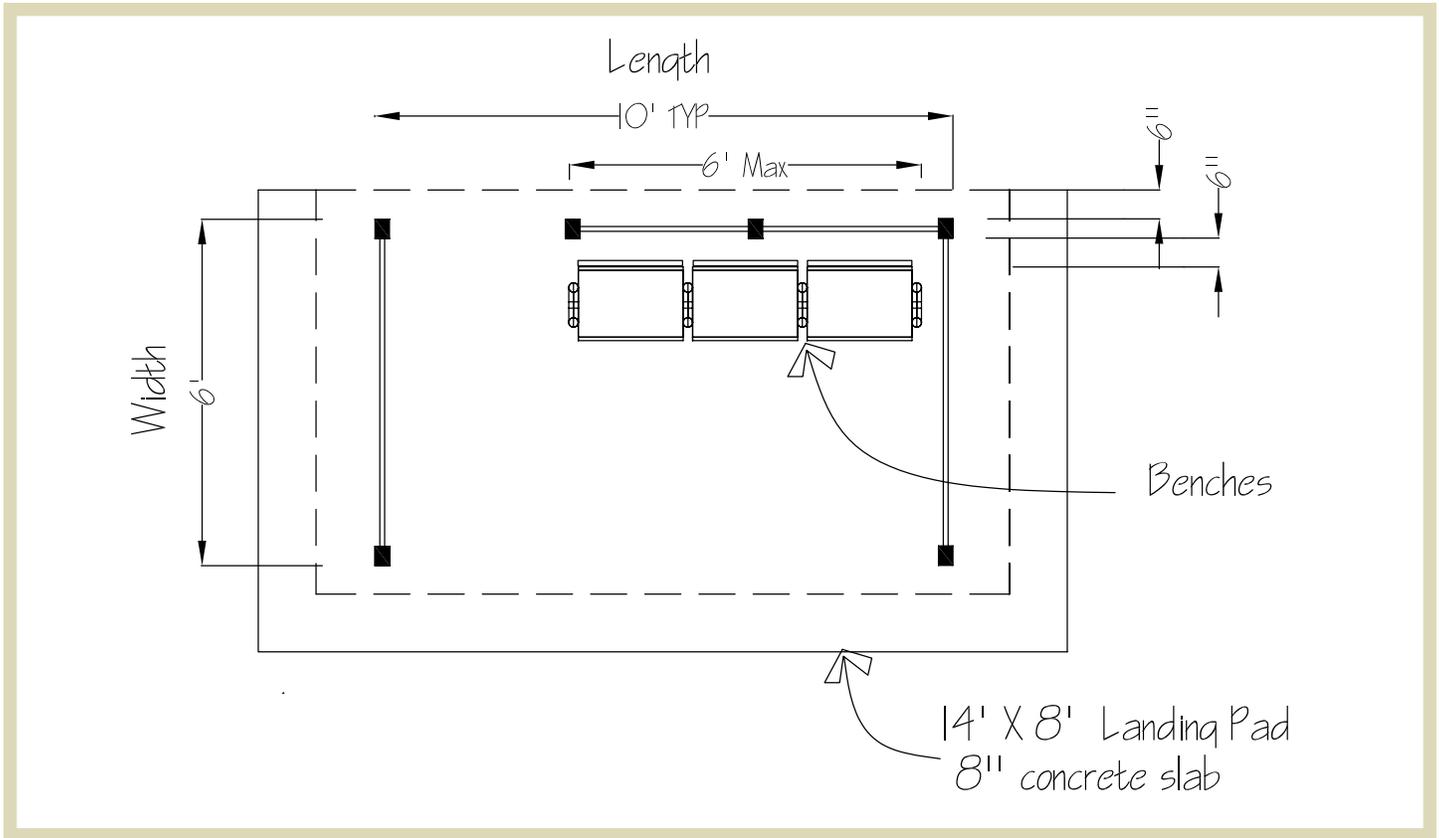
| Typical dimensions of a mid-sized bus shelter.
